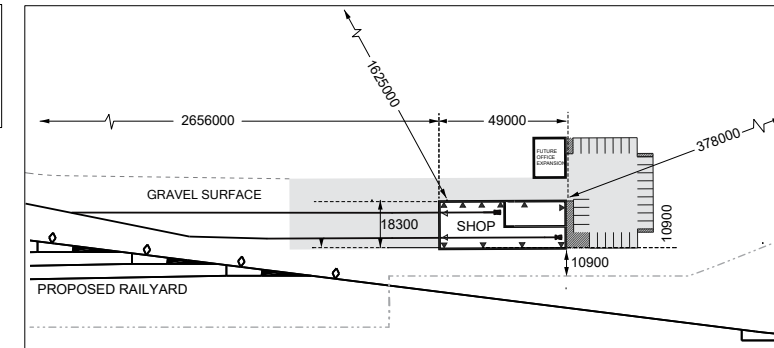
Site Plan for Proposed Rail Yard, Shop, & Parking Area
